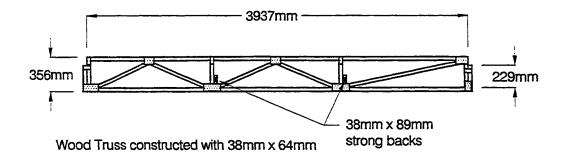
Construction of 356 mm deep wood trusses using 38 x 64 mm lumber
